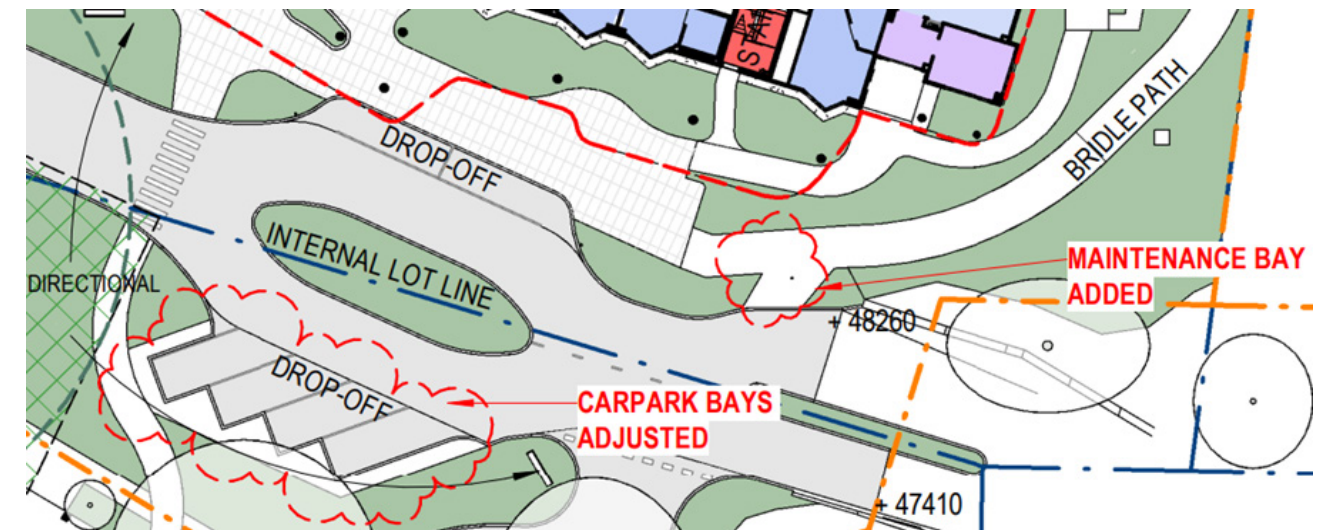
Excerpt of Level 4 plan indicating the additional car parks added to the Drop Off area
